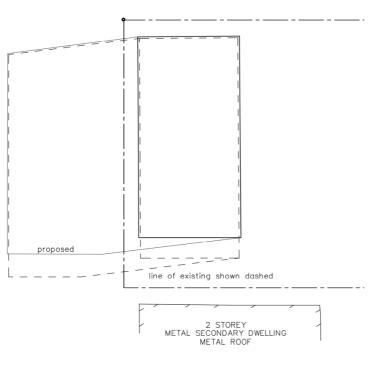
Existing footprint of shed and proposed footprint of secondary dwelling
